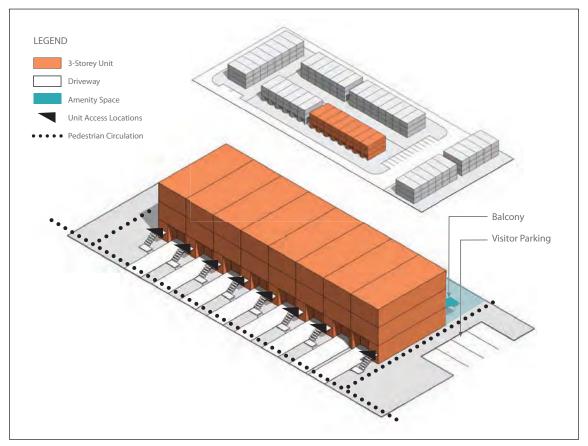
Conceptual massing model of street townhouse example. Options for 2-storey townhouse may be considered.
